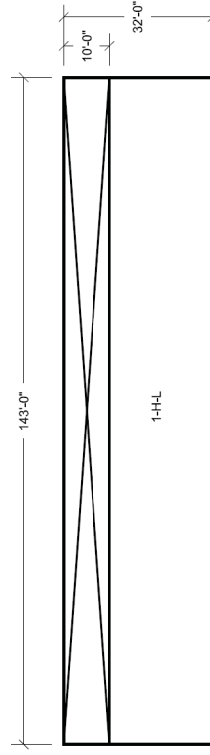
H.6-43: PUMP HOUSE SOUTH WALL LOOKING SOUTH
